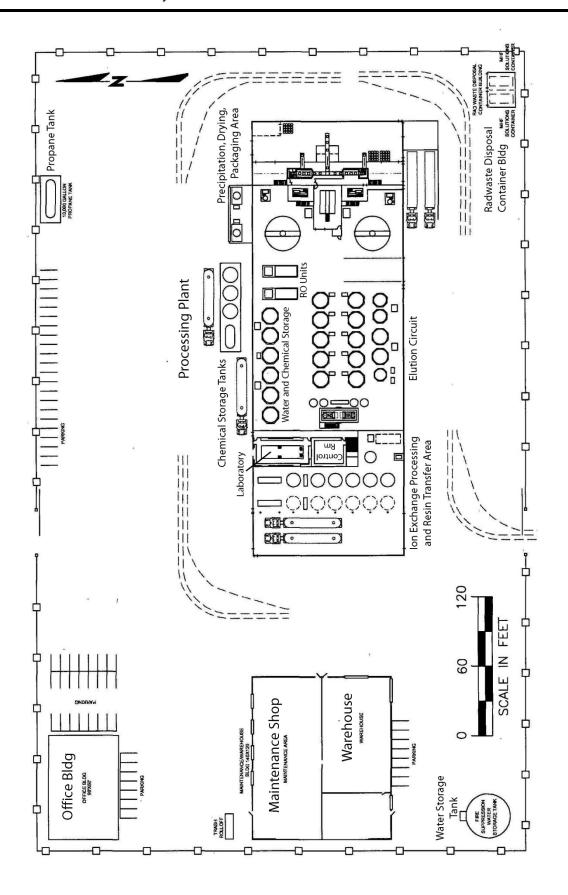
General Site Plan for the Burdock Central Processing Plant. Source: Modified From Powertech (2009b).
